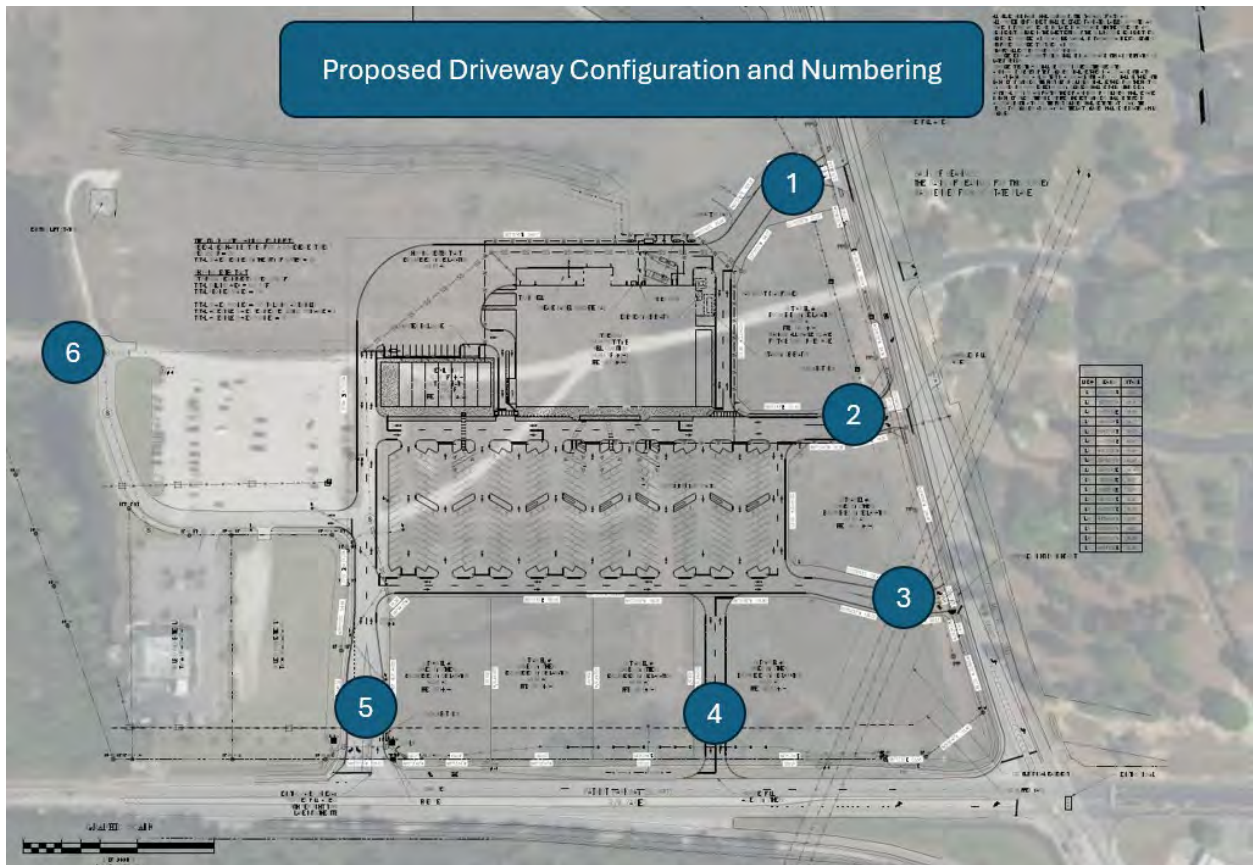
Proposed Master Site Plan for The Shoppes at Patriot Parkway
